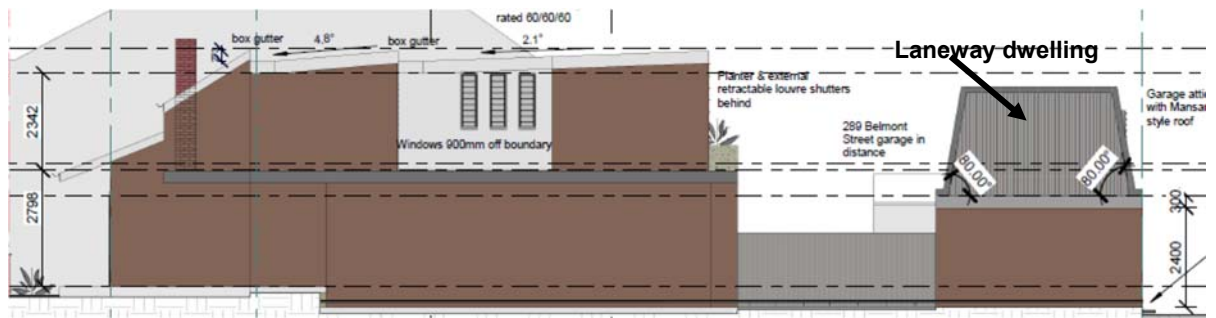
Northern elevation of No. 287 Belmont Street, Alexandria. The laneway dwelling is at the right hand side of the elevational plan, housed in a mansard style roof form. Belmont Street is located to the extreme left of the elevational plan.
